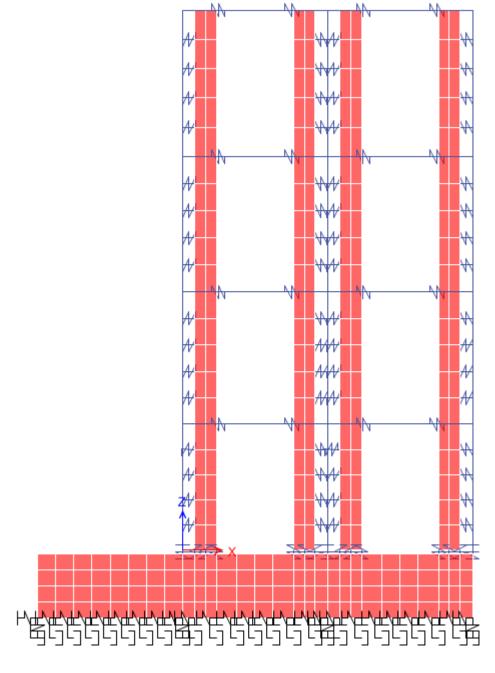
Model of longitudinal direction double frame with extended foundation beam
